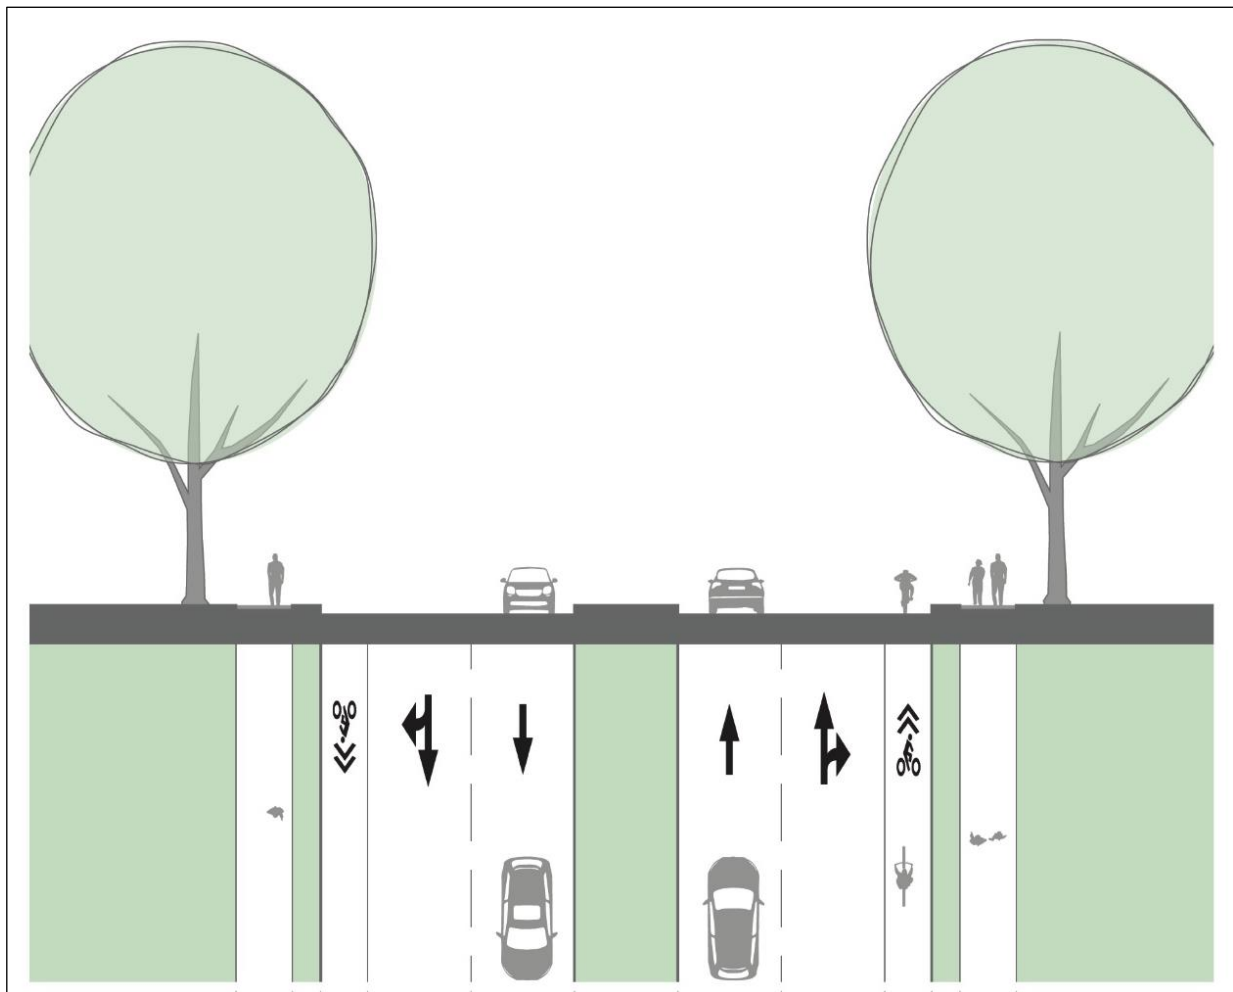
GSFC Greenbelt Campus Master Plan Primary Road Prototype
